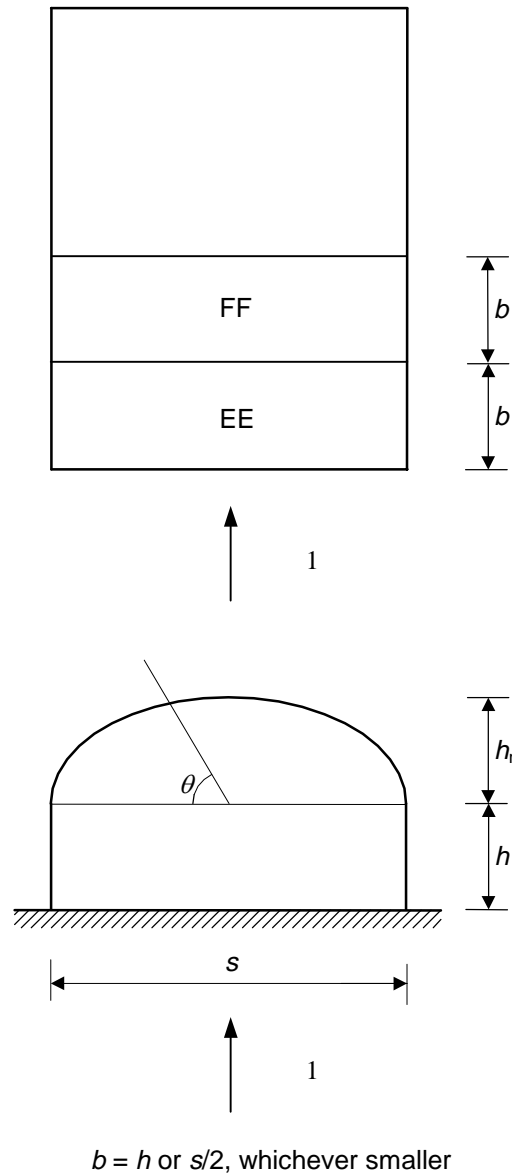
Zones for the vaulted roof of single span greenhouses without eaves
